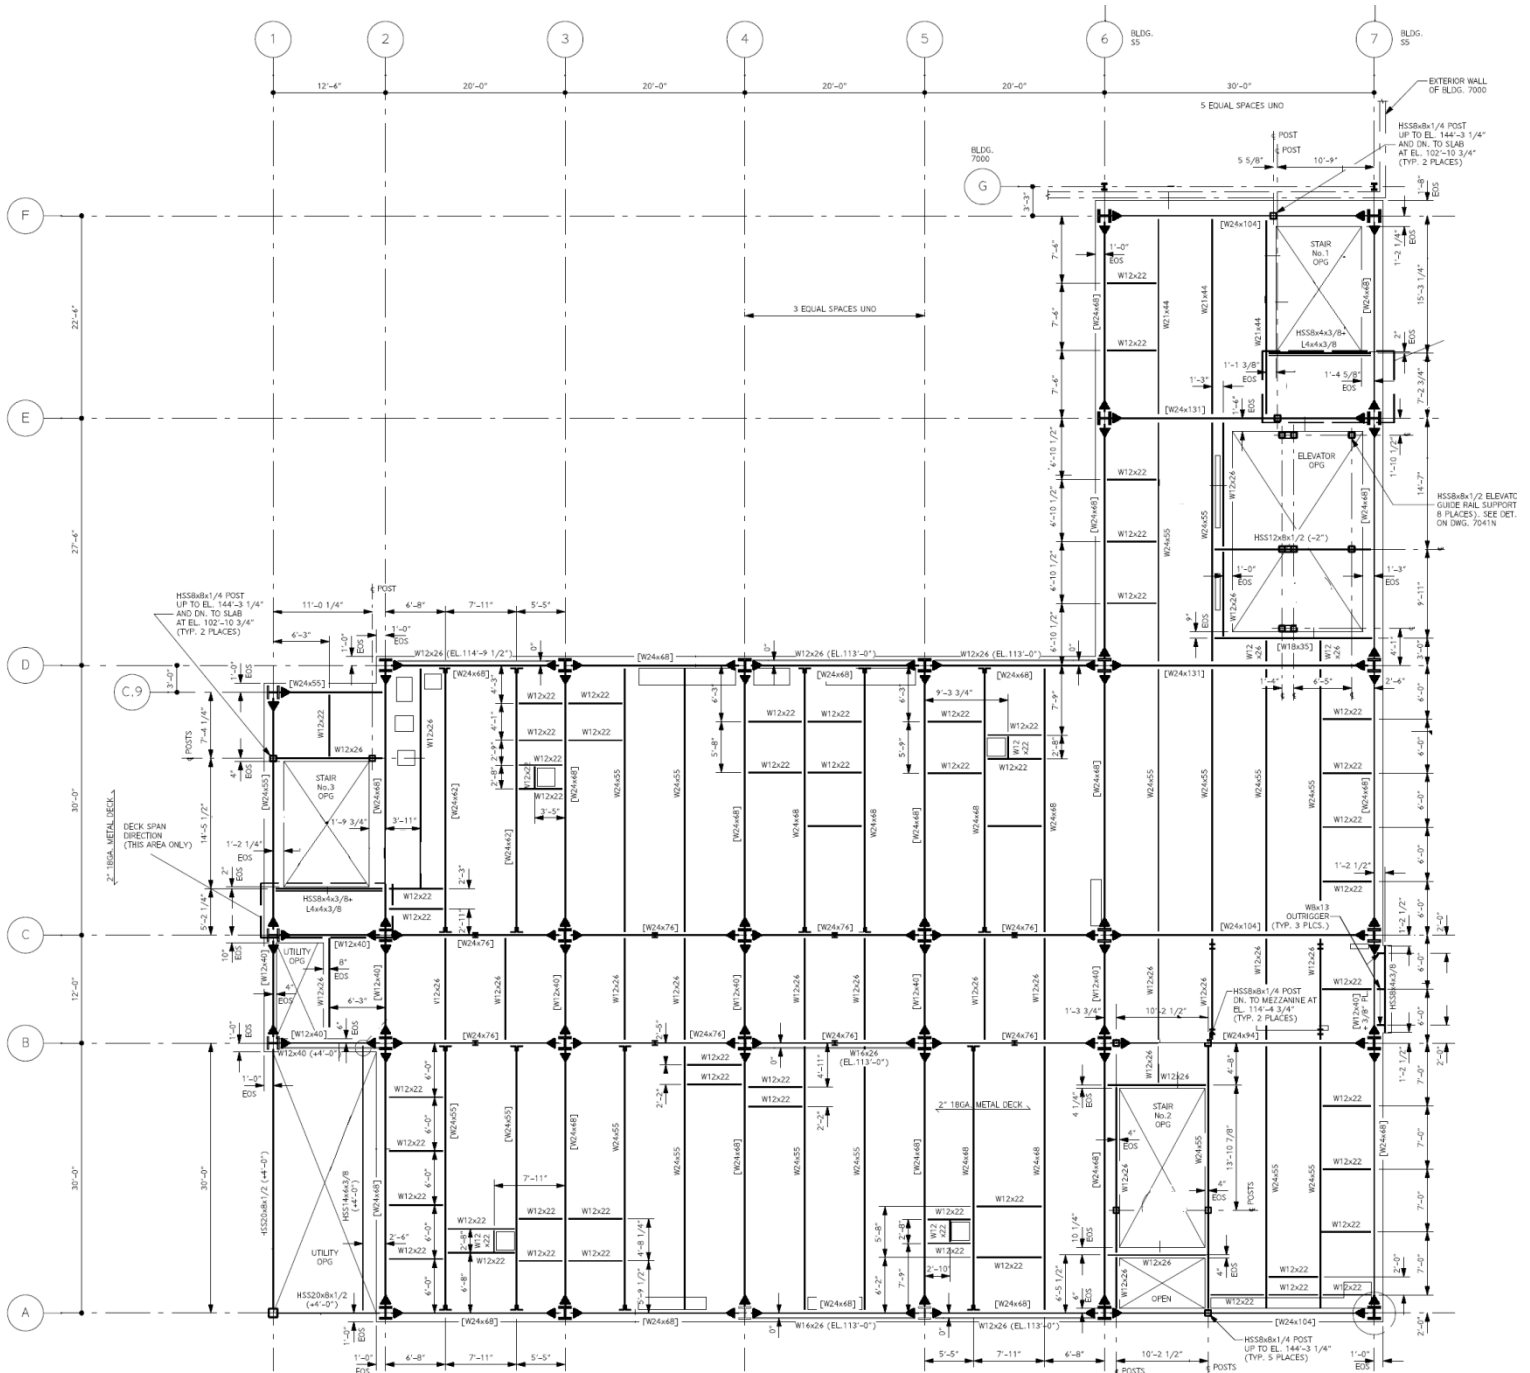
Courtesy of Project Engineer. The second floor framing plan.
